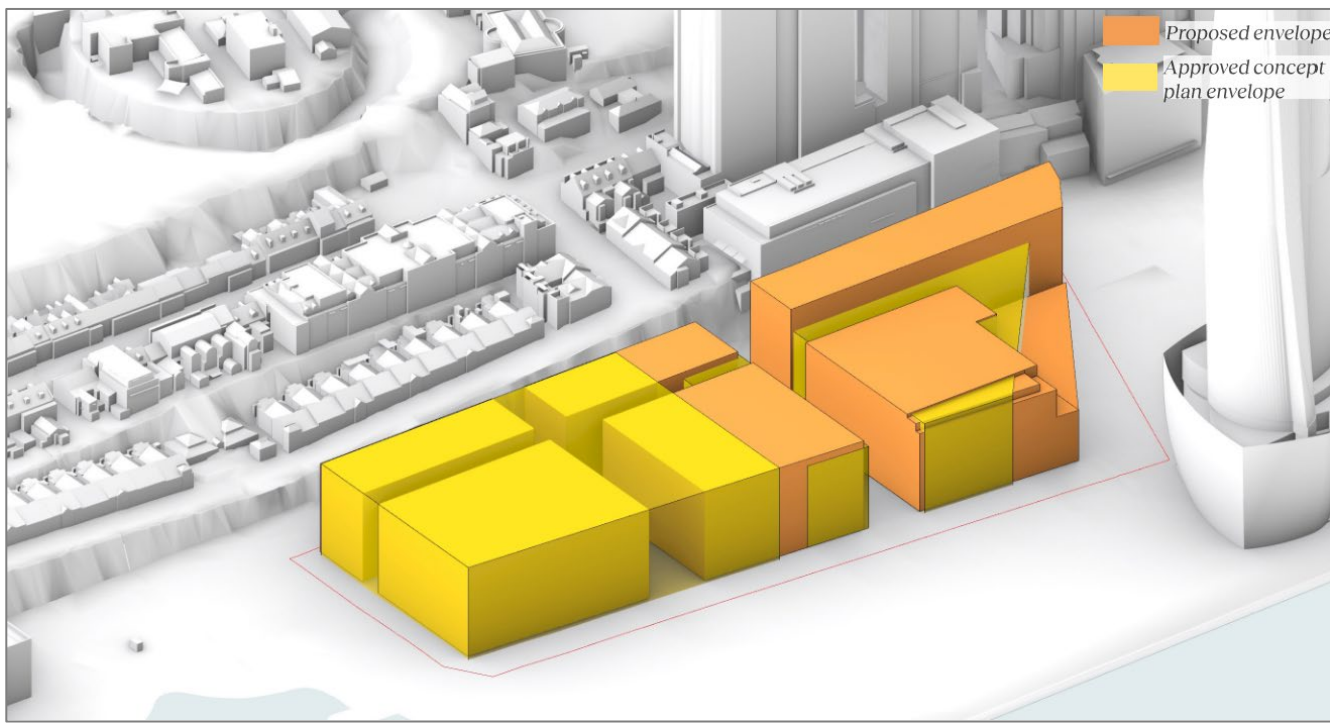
APPROVED AND PROPOSED CONCEPT PLAN BLOCK LAYOUT (SJB)
